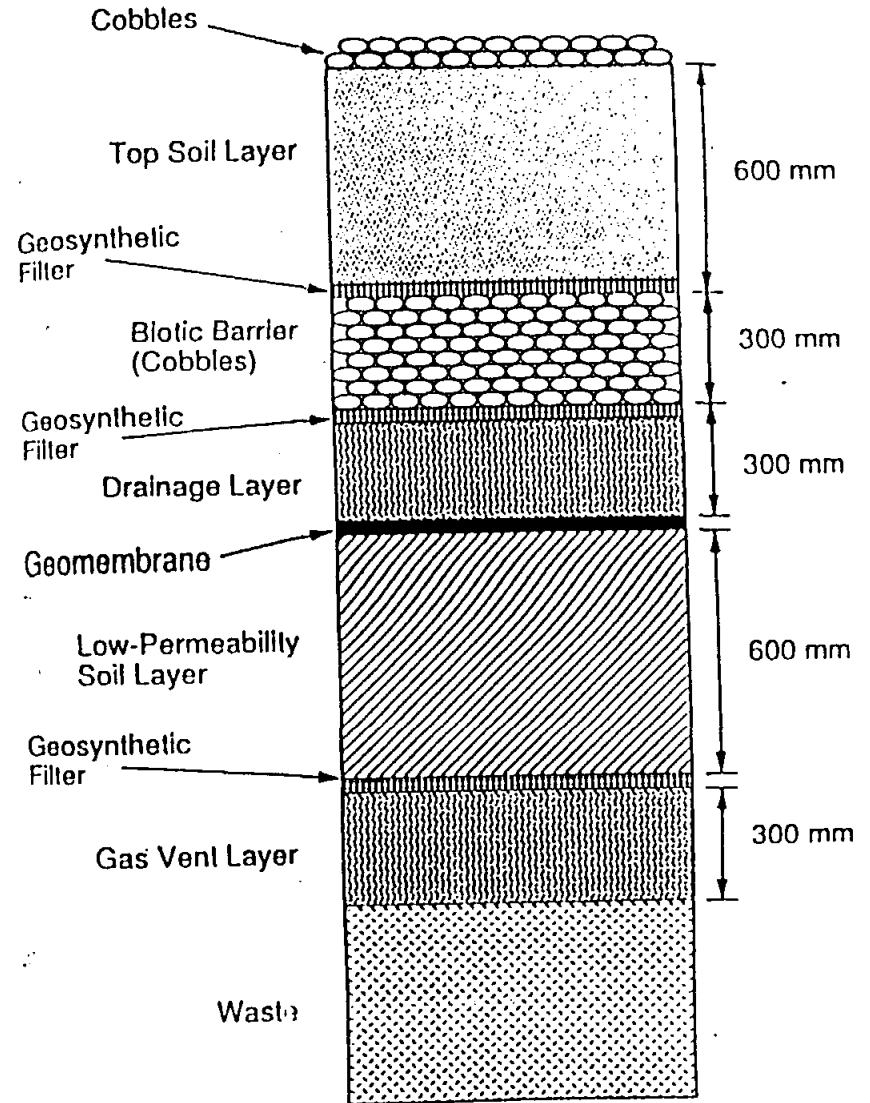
Alternative recommended surface barrier for hazardous-waste disposal facility (after USEPA, 1989).
